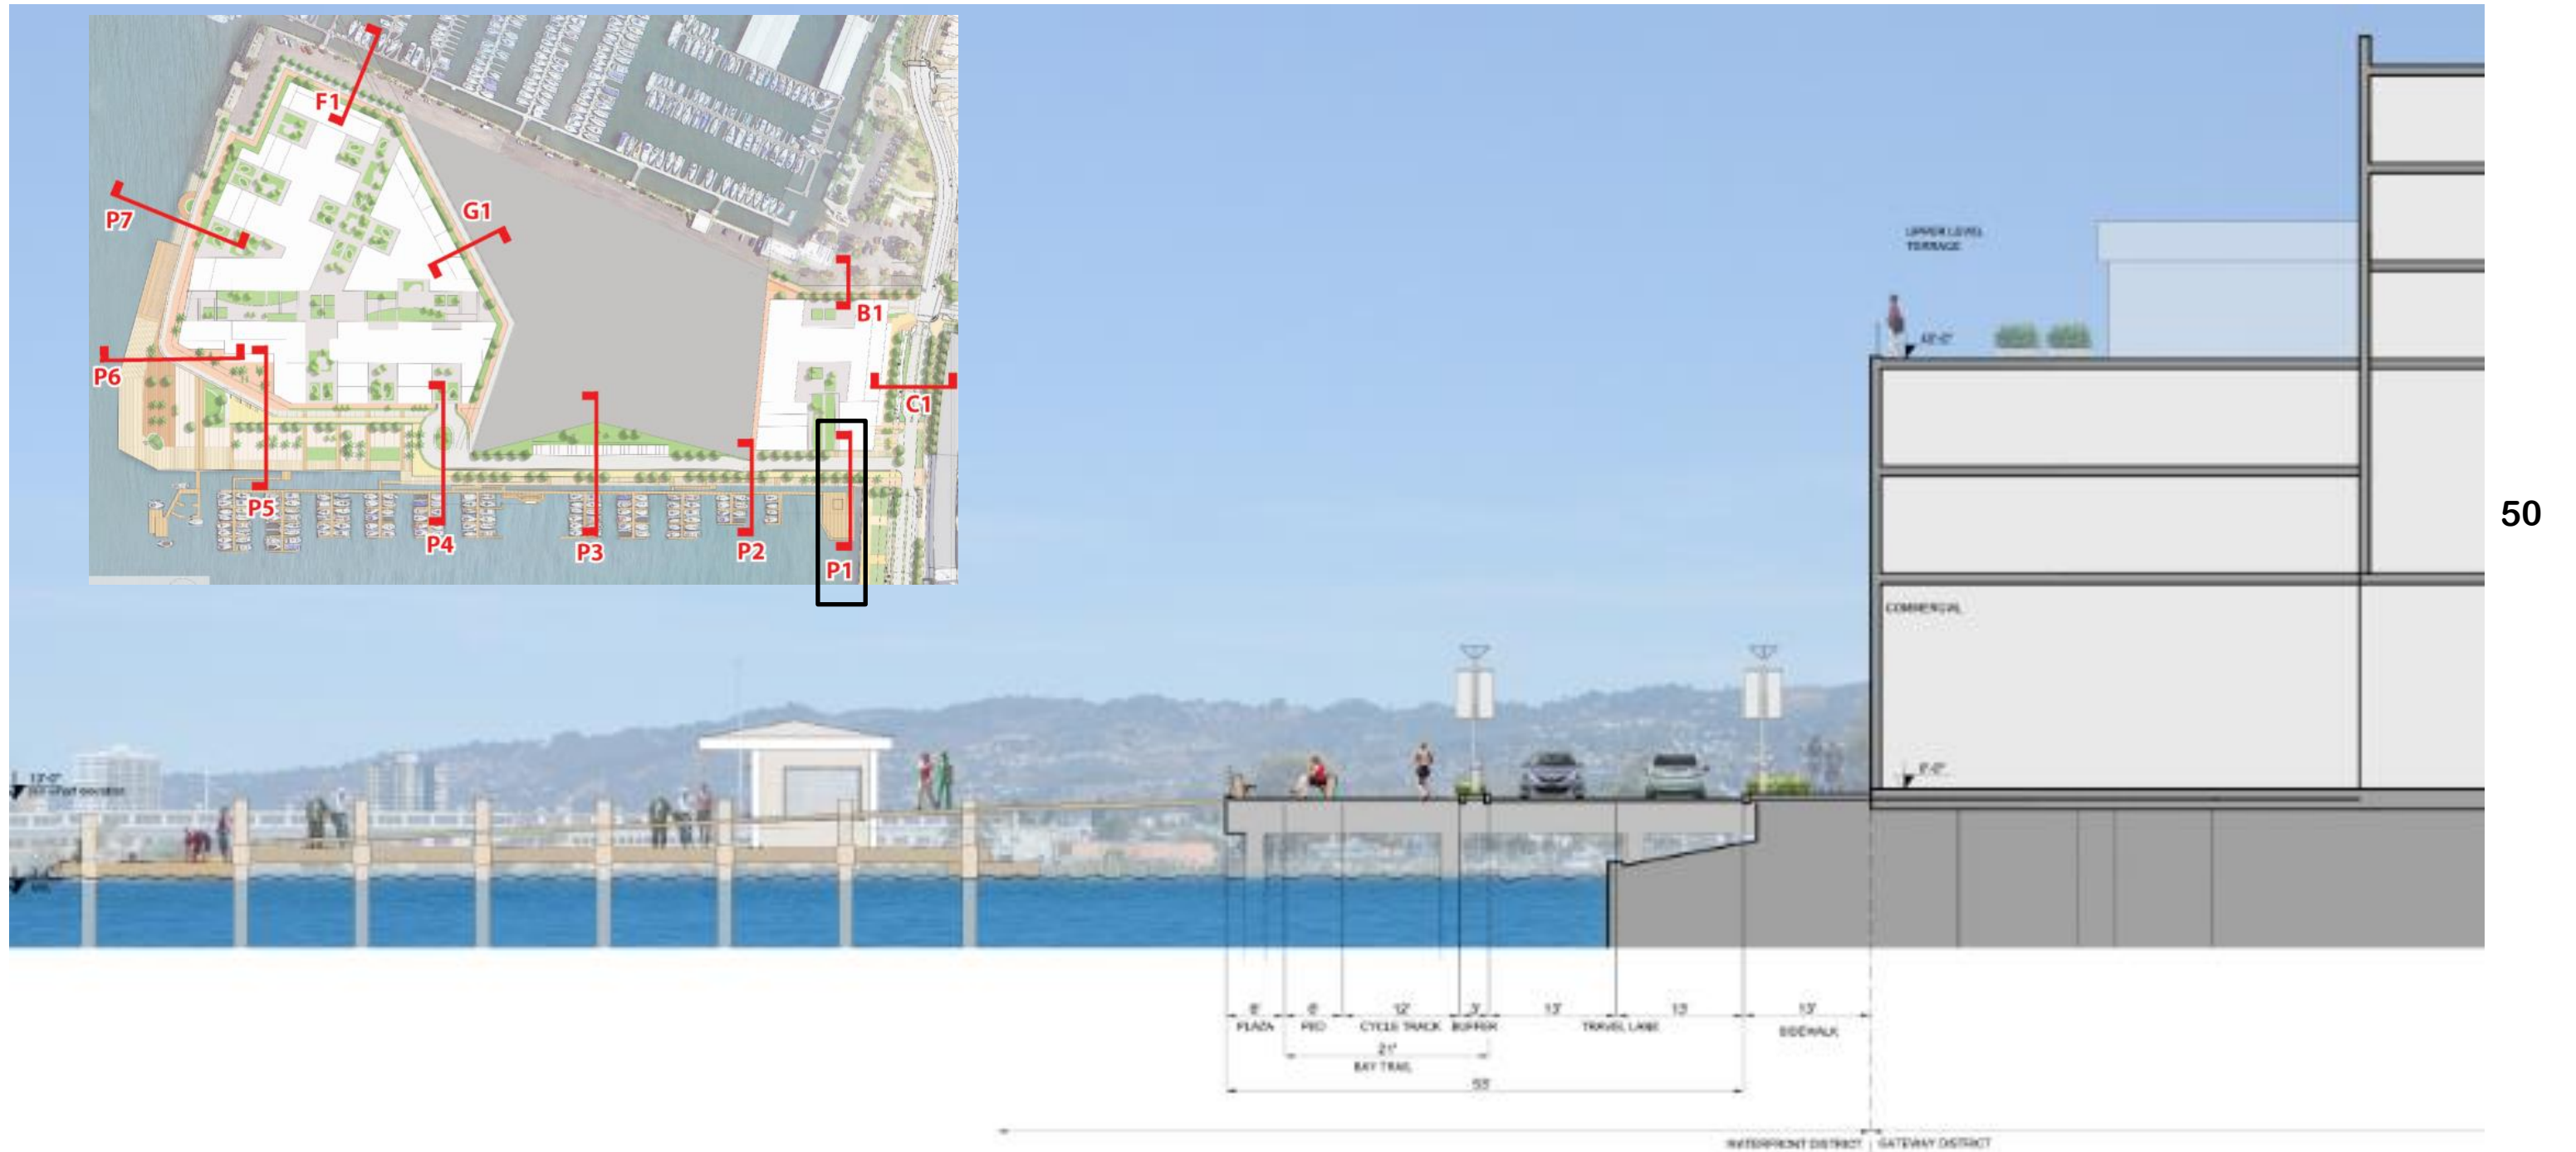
ILLUSTRATIVE CROSS SECTION P1: ENTRY BOULEVARD AND BAY TRAIL (VIEW LOOKING NORTH FROM CLEMENT AVENUE)
